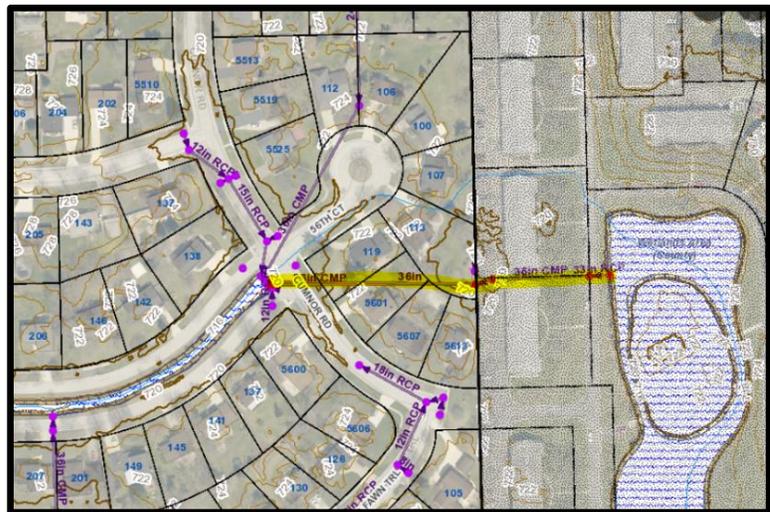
Highlighted pipe shows location of undersized storm sewer from King Arthur Court Apartment pond to St. Joseph Creek.
